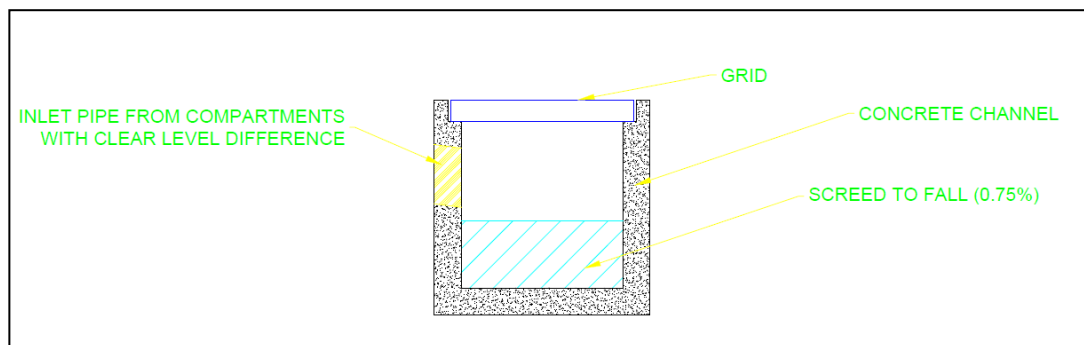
TYPICAL CHANNEL CROSS SECTION
